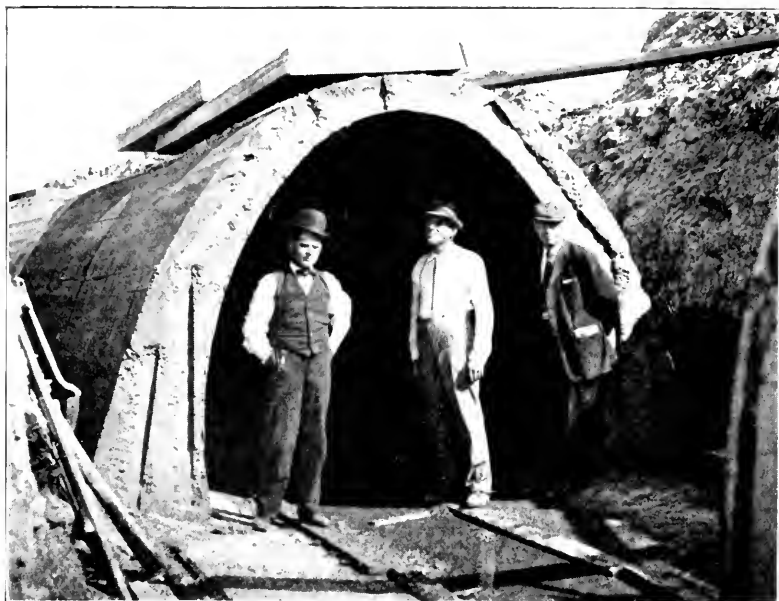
MAIN INTERCEPTING SEWER. 90-INCH SECTION. SHALLOW TRENCH.
